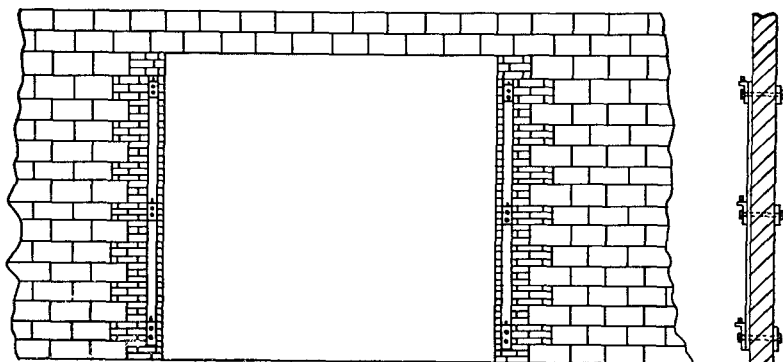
Concrete block wall prepared for doors swinging in pairs — lap mounted, standard method.
